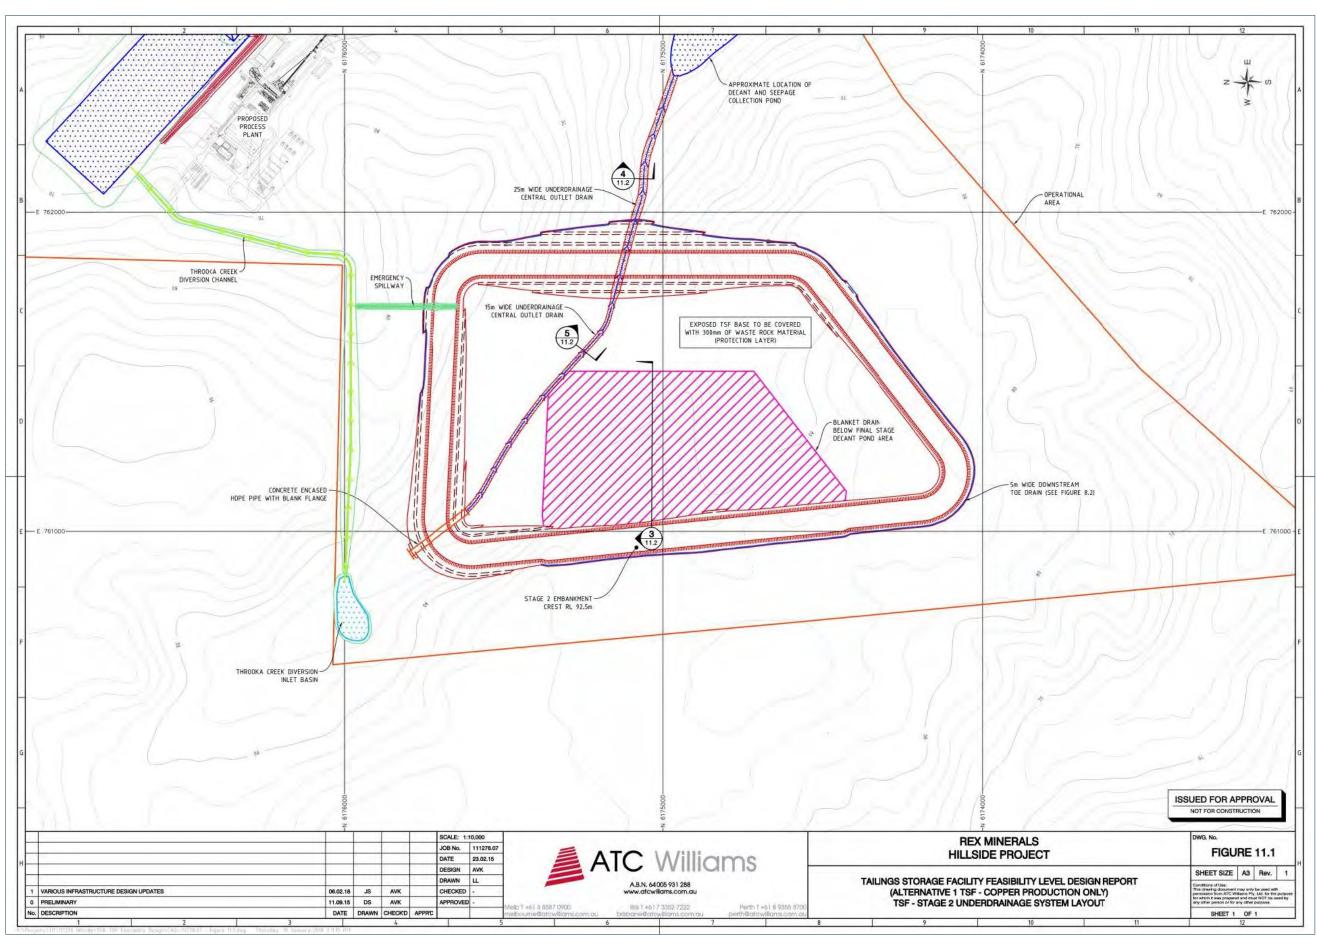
Phase (lift) 2 of TSF underdrainage system layout
